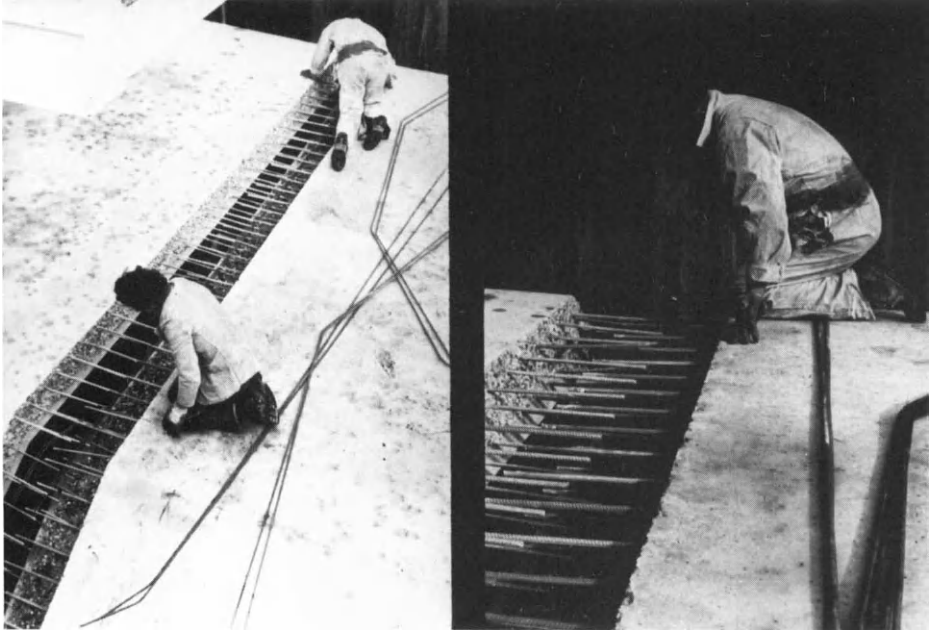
Horizontal position of a shell segment at the prefabrication site
